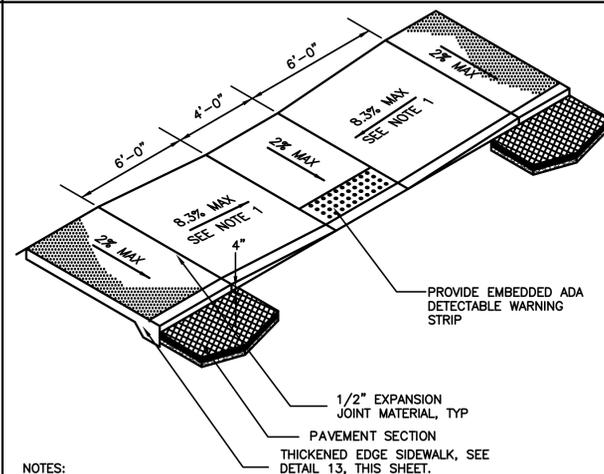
4" STANDARD CONCRETE SIDEWALK
